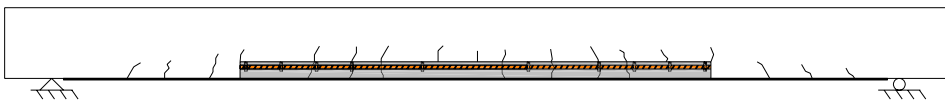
Crack pattern for repaired and strengthened beam specimen after failure test.
